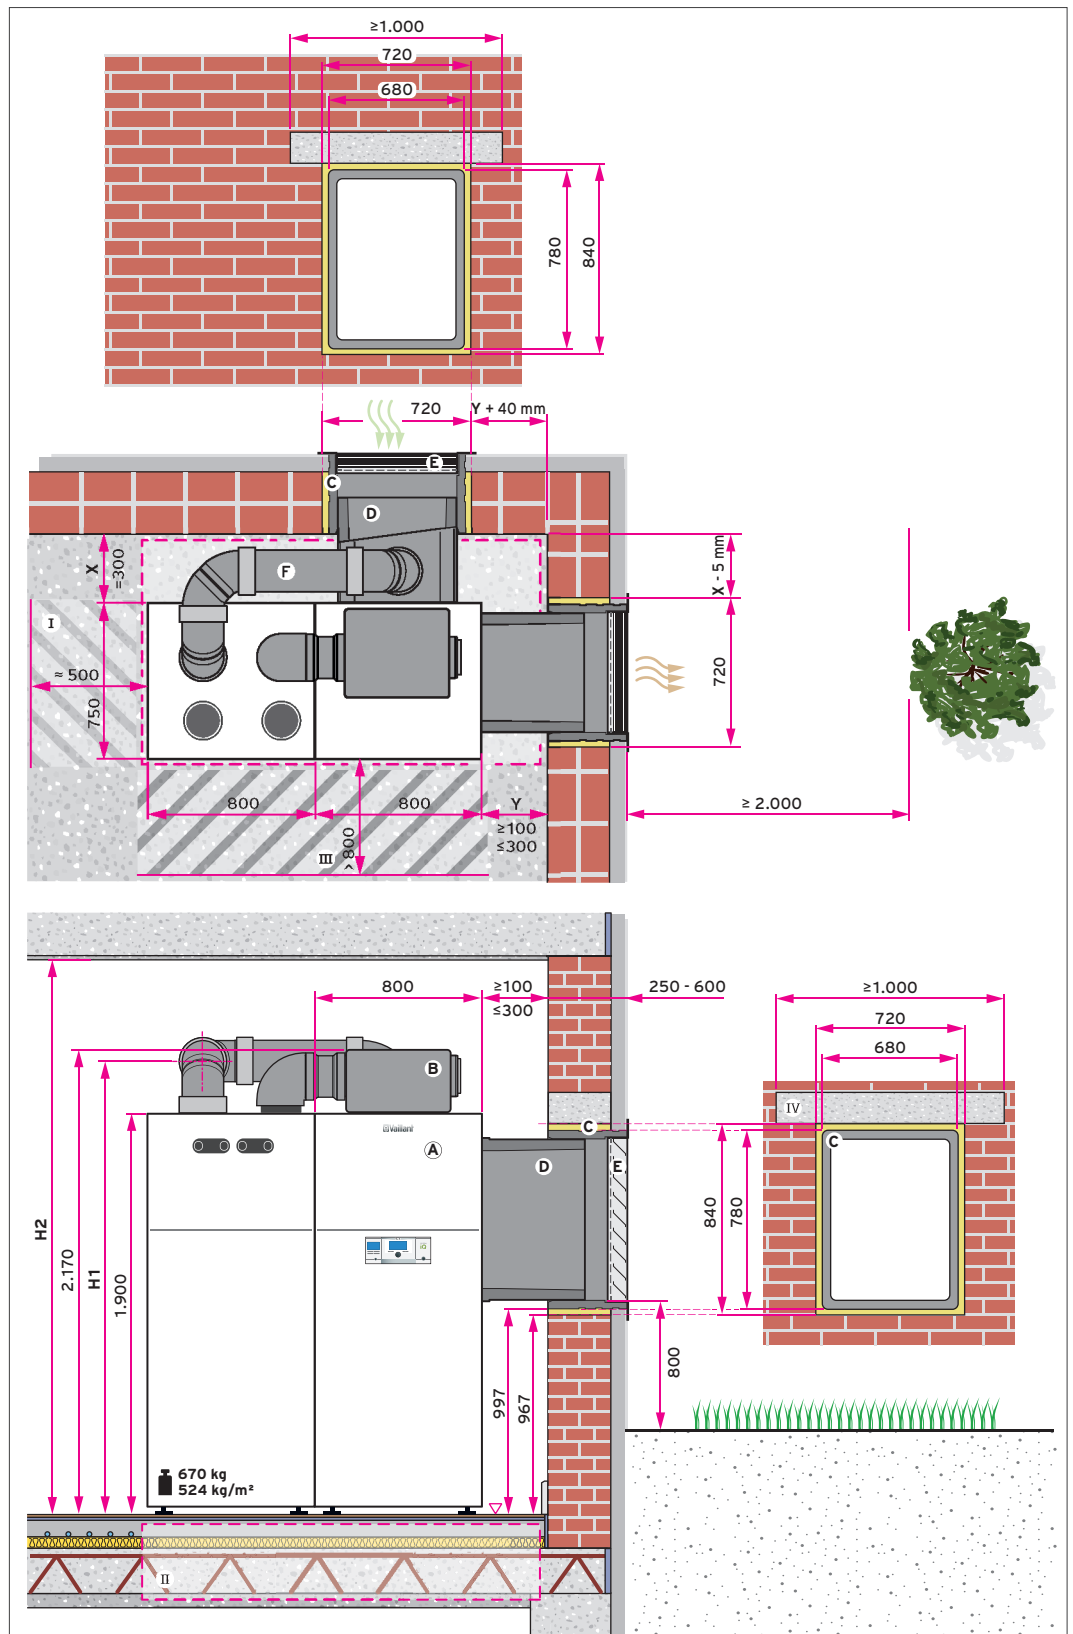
recoCOMPACT installation situation, ground floor - corner installation with a VWZ adapter set
